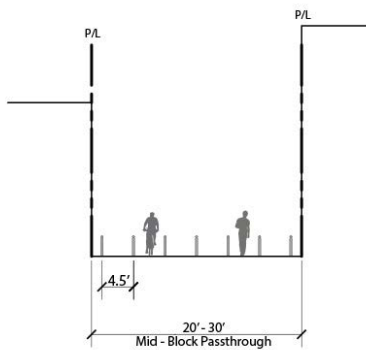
Mid-Block Passthrough Typical Cross-Section. Source (right): One Colorado Pasadena Social Media.
